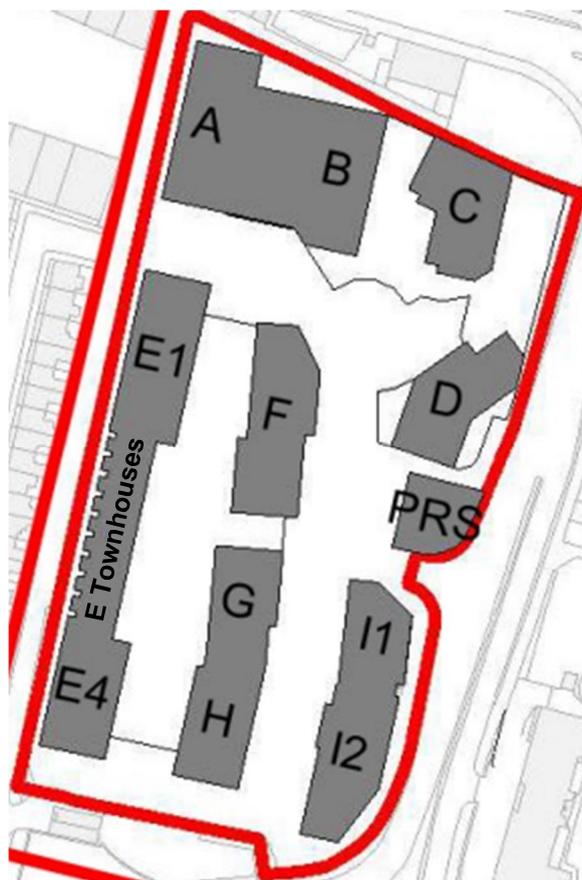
Proposed site plan. Adapted from drawing by ERP Architects as submitted as part of the application.
